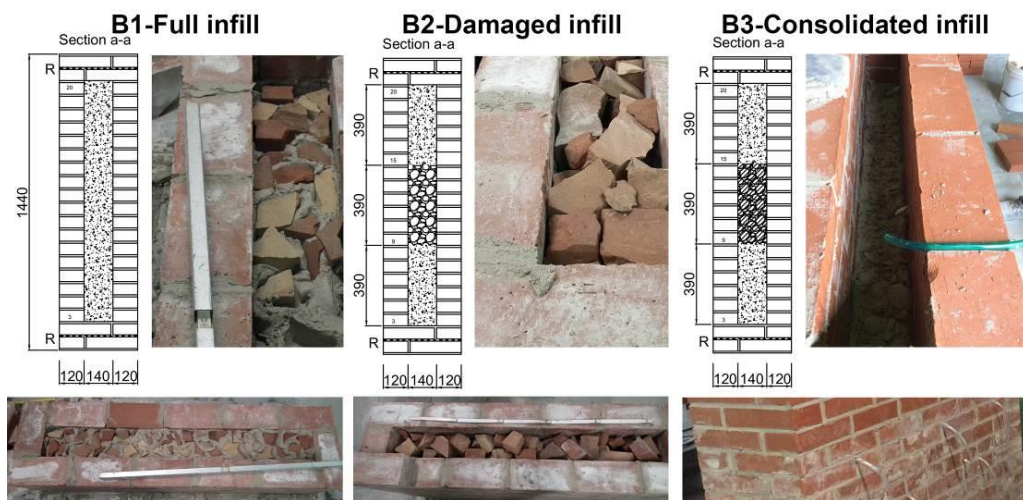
Different typologies of masonry specimens, B1 full infill, B2 damaged infill, B3 consolidated infill (dimension in millimeters).
